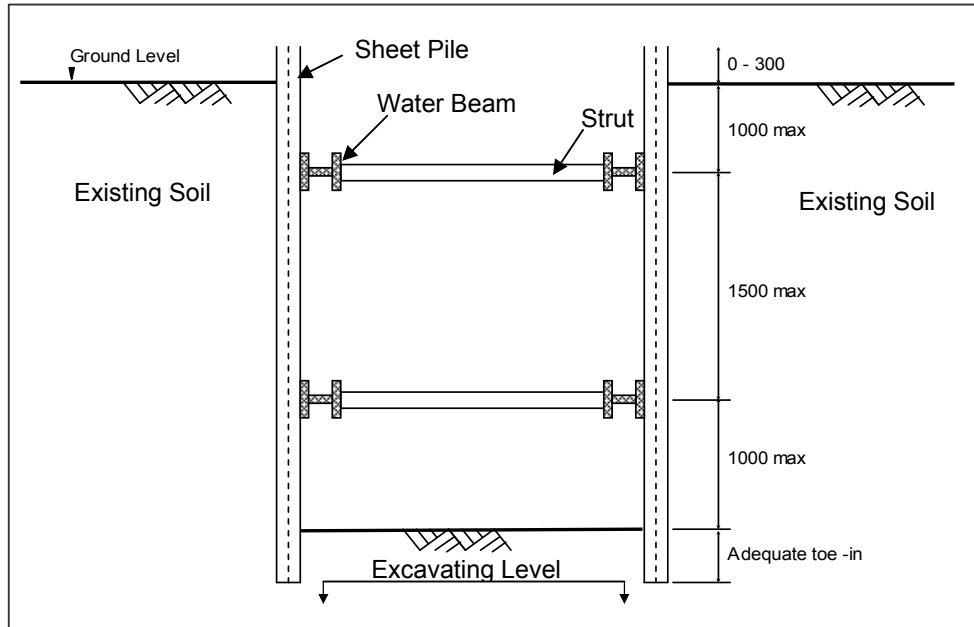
Typical sheet pile shoring detail with steel struts and water beams
